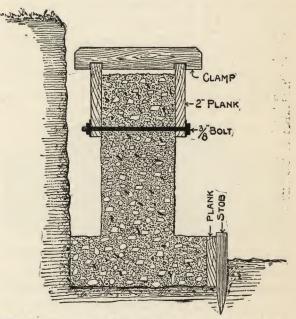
Clamp and bolt method of form construction for a cellar wall.
